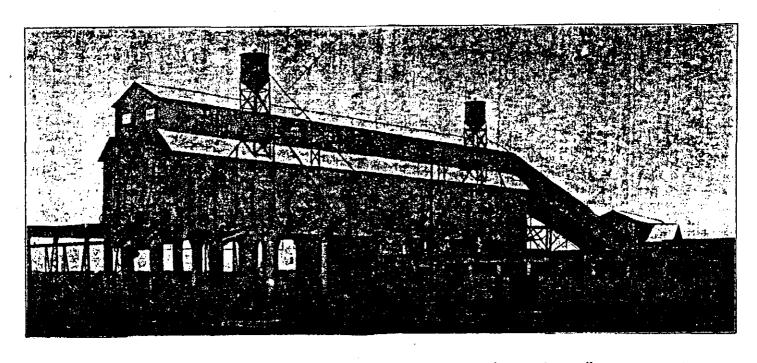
Reinforced concrete coaling station and sandhouse (right foreground) serving engines on ten tracks (Railway Age Gazette 1914A: 1,586).
